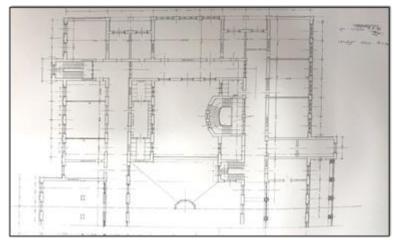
Gazi Education Institute, Second Floor Plan, (Yavuz, Y, Empire to Republic Architect Kemalettin 1870-1927, Source: GEEA)
